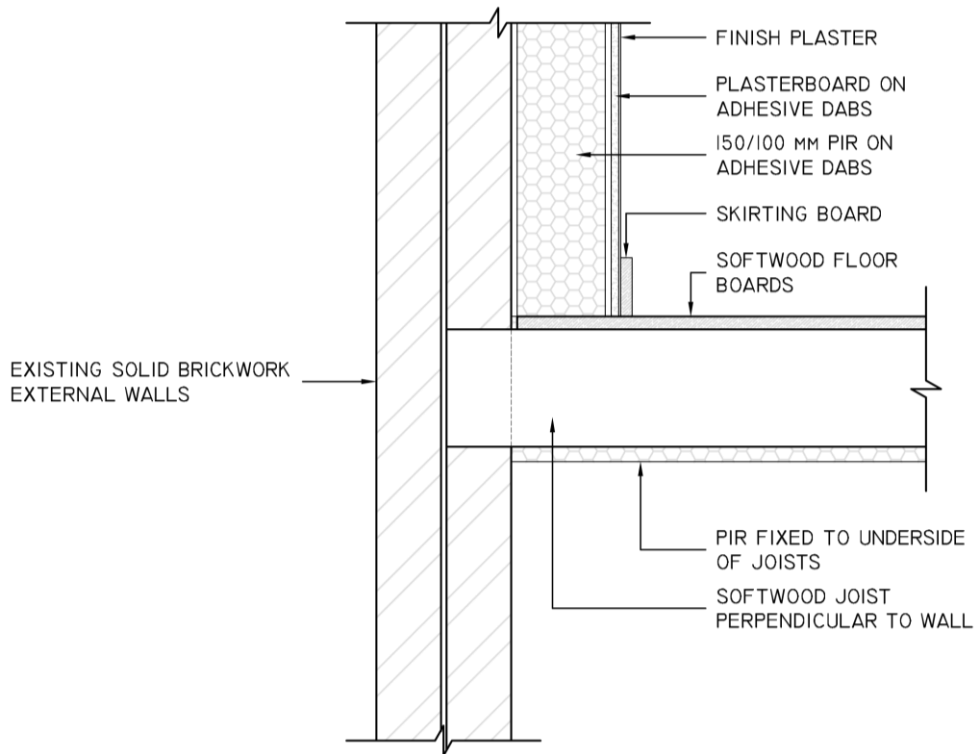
Ground Floor Junction with Joist Perpendicular to External Wall
